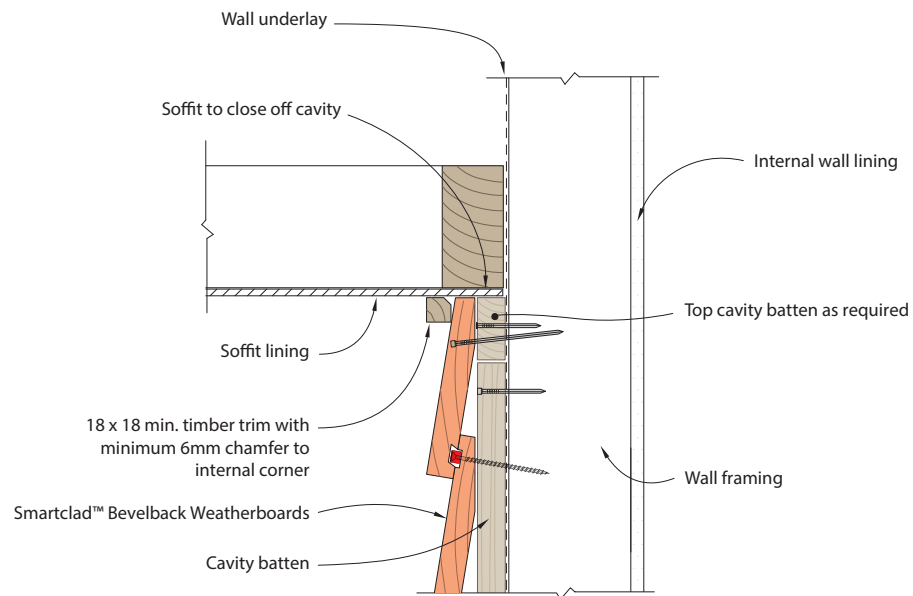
Bevel Back — Top of Wall — Sloping Soffit
